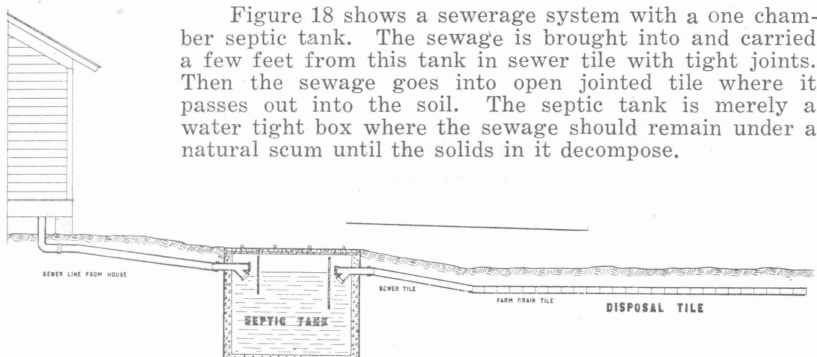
shows a sewerage system with a one chamber septic tank. The sewage is brought into and carried a few feet from this tank in sewer tile with tight joints. Then the sewage goes into open jointed tile where it passes out into the soil. The septic tank is merely a water tight box where the sewage should remain under a natural scum until the solids in it decompose.
